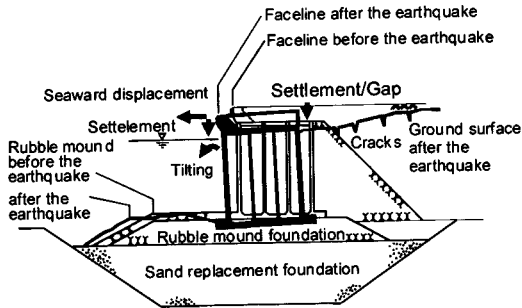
A typical failure mode of a gravity type quay wall due to the earthquake
